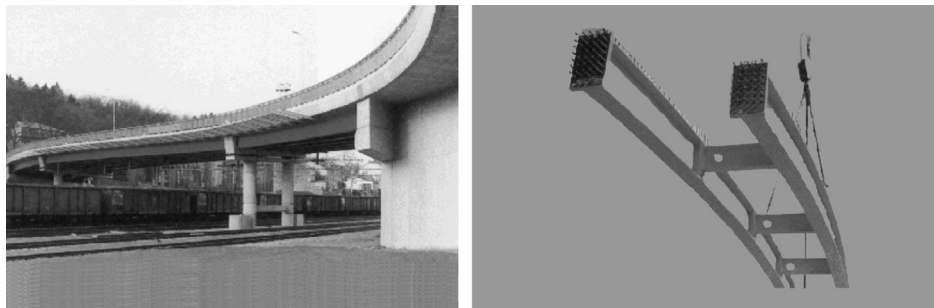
Three-span bridge in Differdange (South Luxembourg).
